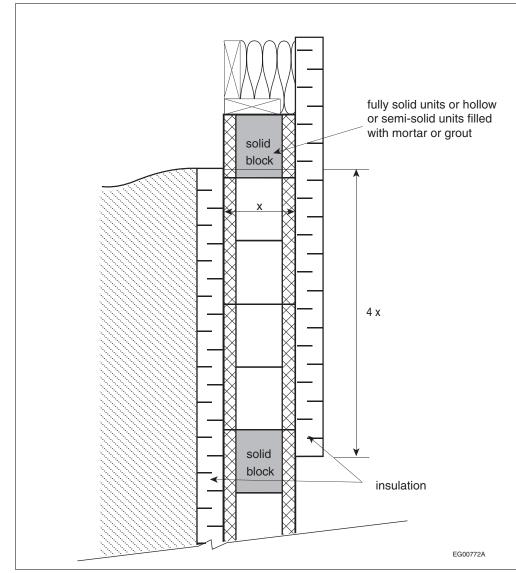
(5)-B Application of Sentence 9.36.2.5.(5) to a hollow-core masonry foundation wall
